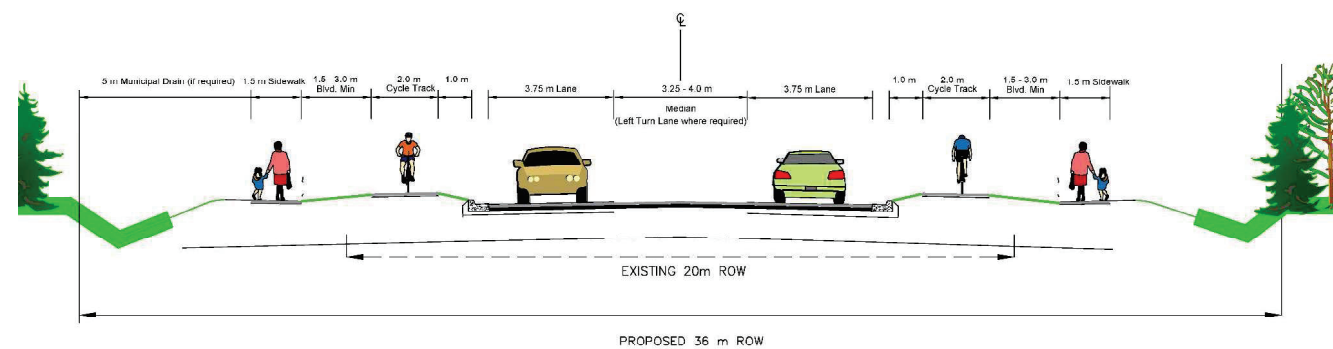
Concession Roads 8 and 9 – Alternative 4 – 3-Lane Urban Cross Section with Cycle Tracks and Sidewalks
